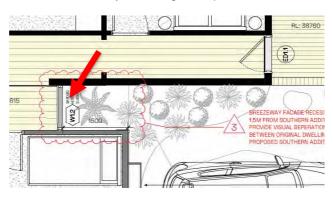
Glass line setback 1.5m behind the south additions.
